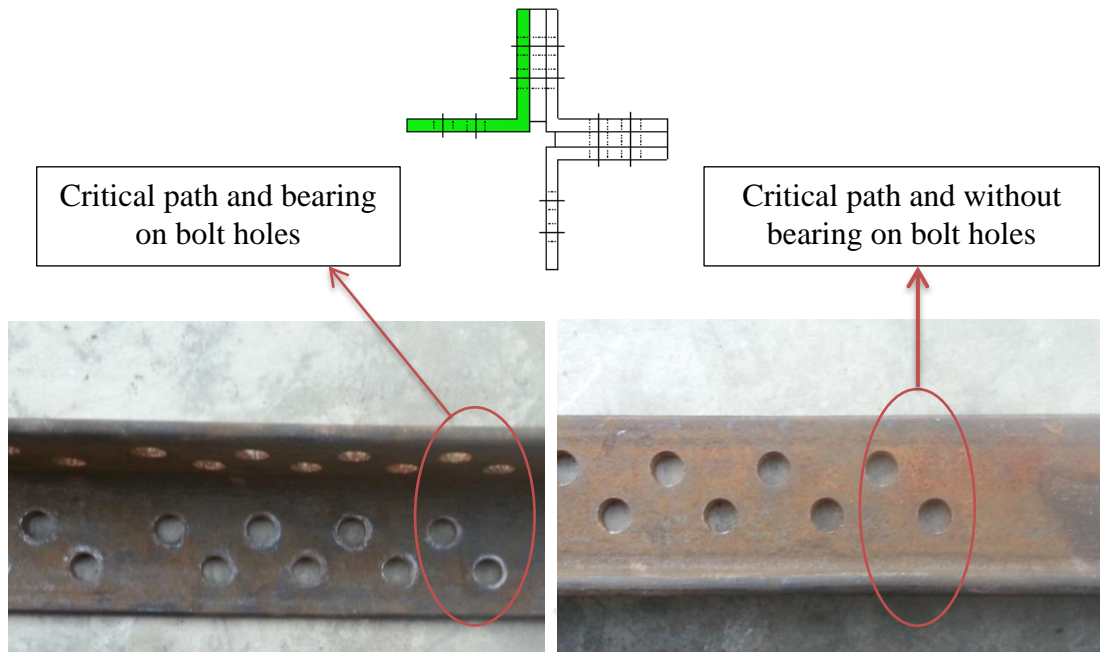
Bearing on lower main member 1 (Specimen-7)
